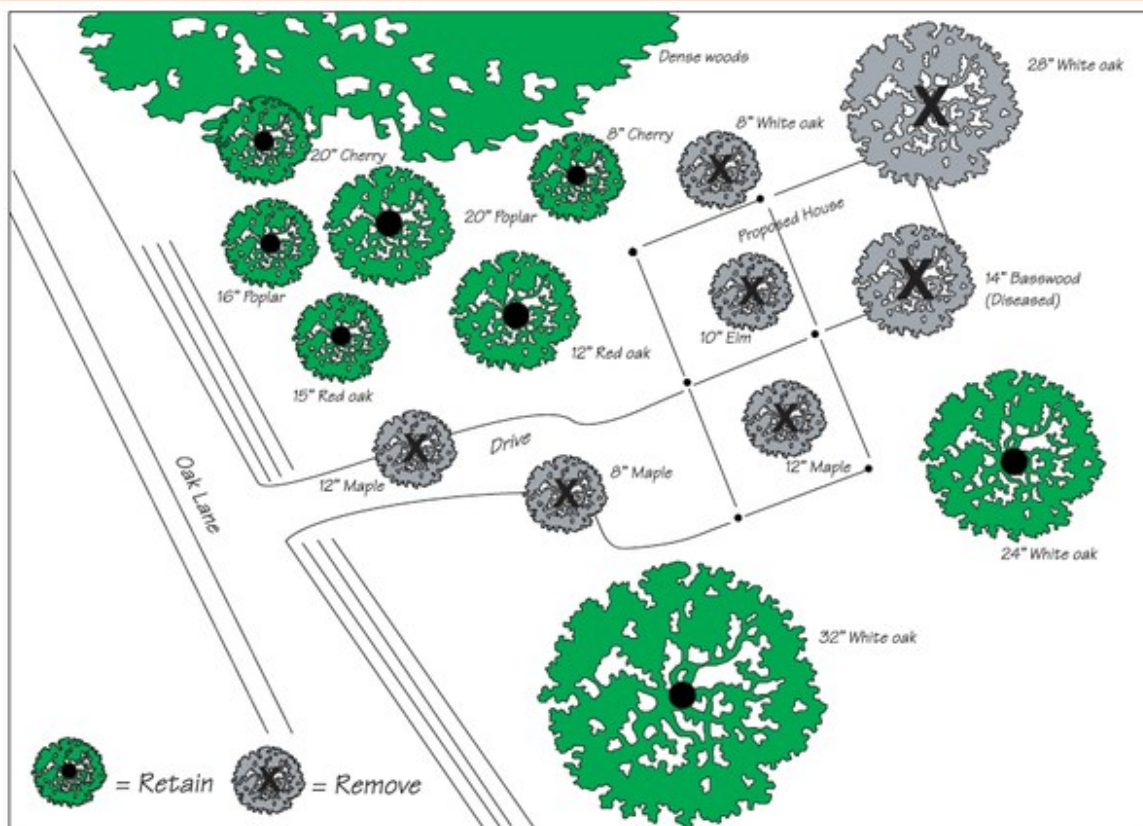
Example site plan with trees to be removed in grey. It is helpful to show and dimension the tree protection zones to protect existing trees.
